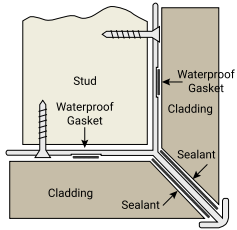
Aluminium External Corner Stop (install prior to cladding)
